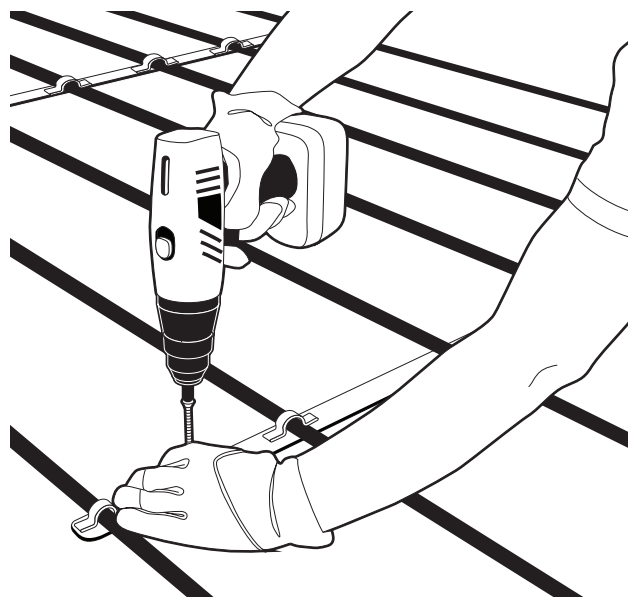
Fastening to an existing slab: Climate Mat may be nailed or screwed to a sub-slab for a thin-slab application.
